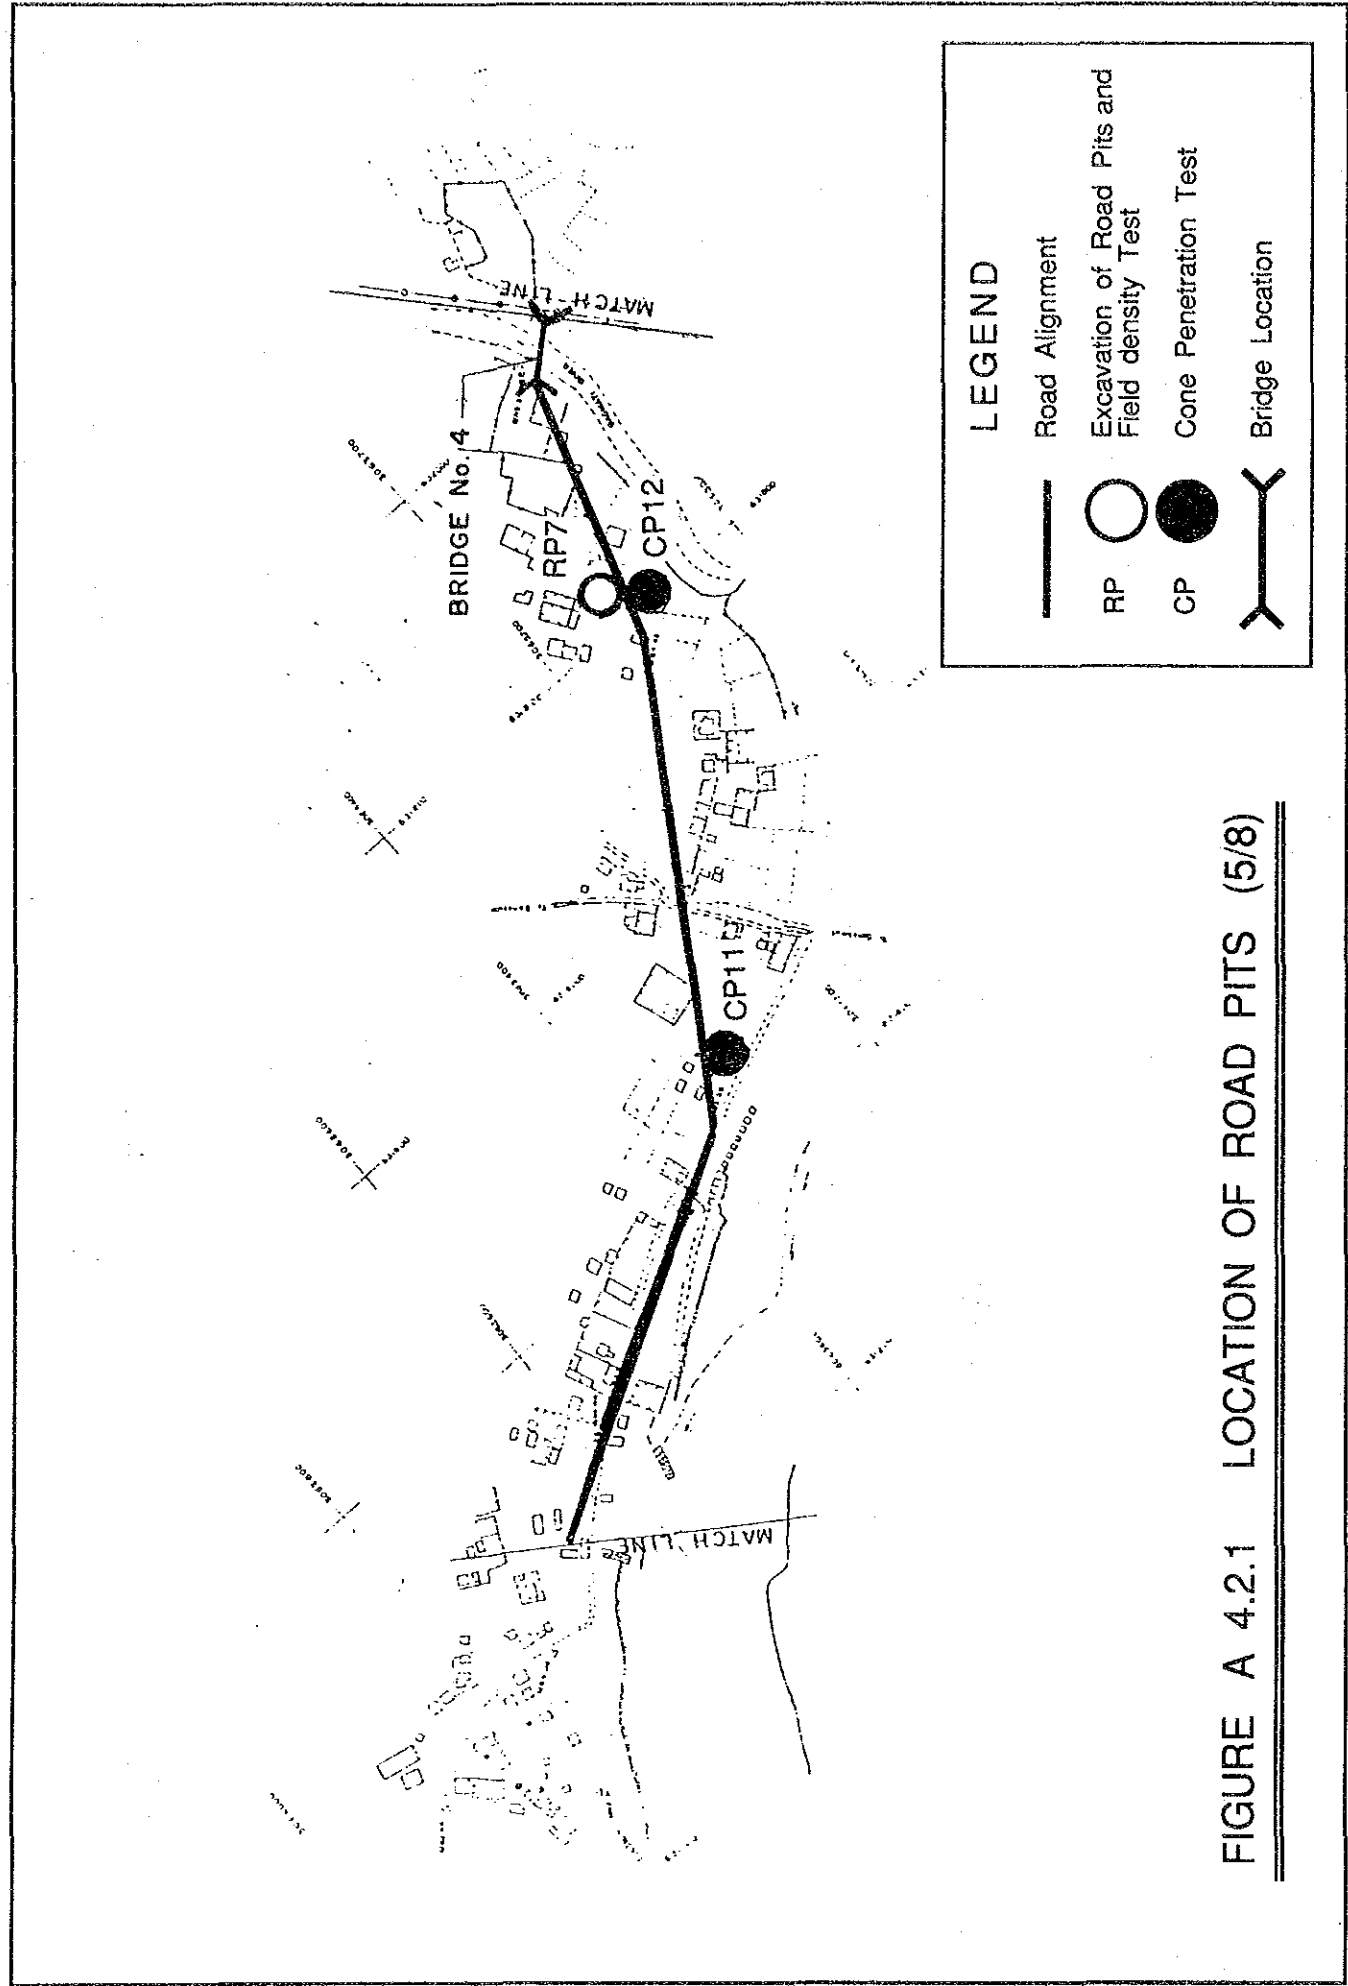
LOCATION OF ROAD PITS (5/8)
